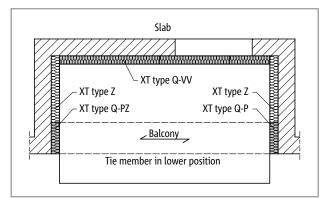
Schöck Isokorb® XT type Q-VV, Q-P, Q-PZ: Recessed balcony, supported on three sides with tie member
